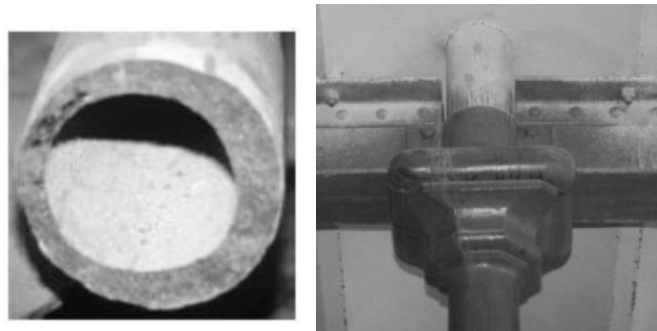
Circular section of a cast-iron pillar (left) and its connection to a steel beam (right) (Paricio Casademunt, 2001).
